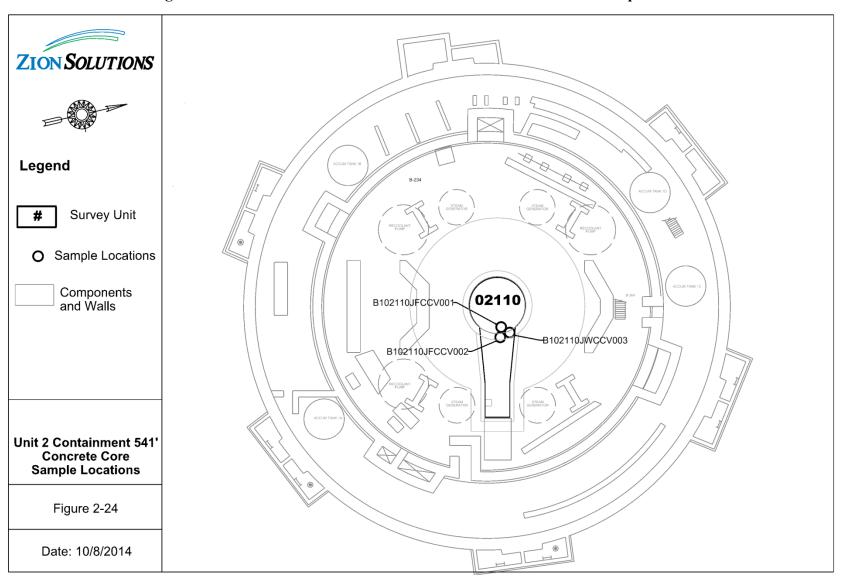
Unit 2 Containment 541 Foot Elevation Concrete Core Sample Locations
